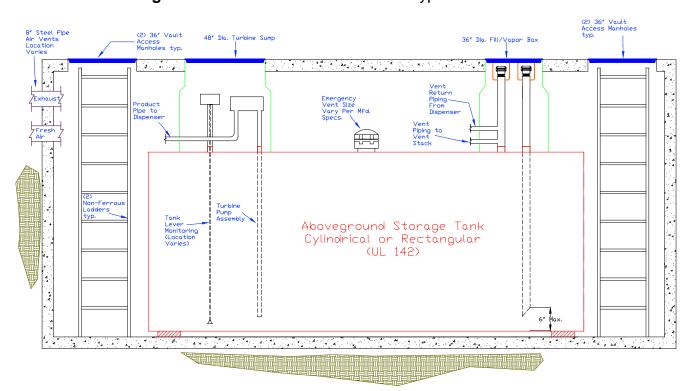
Front Sectional Views of Typical Vaulted AST
